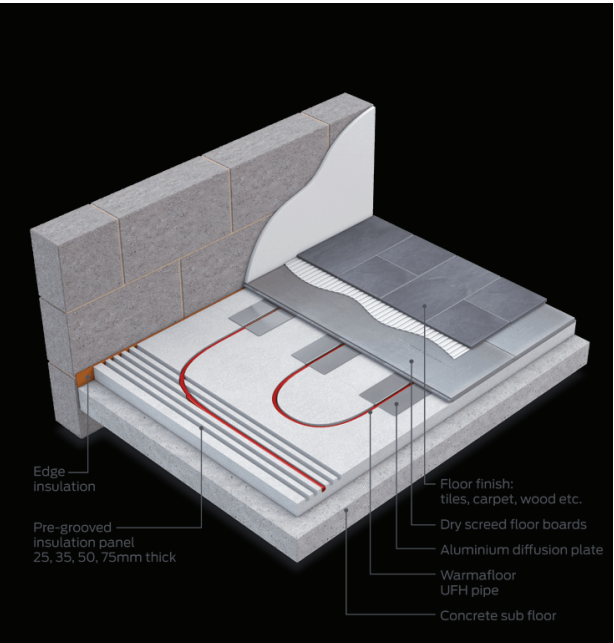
“Underfloor Heating and Cooling Systems.” by Warmafloor.
